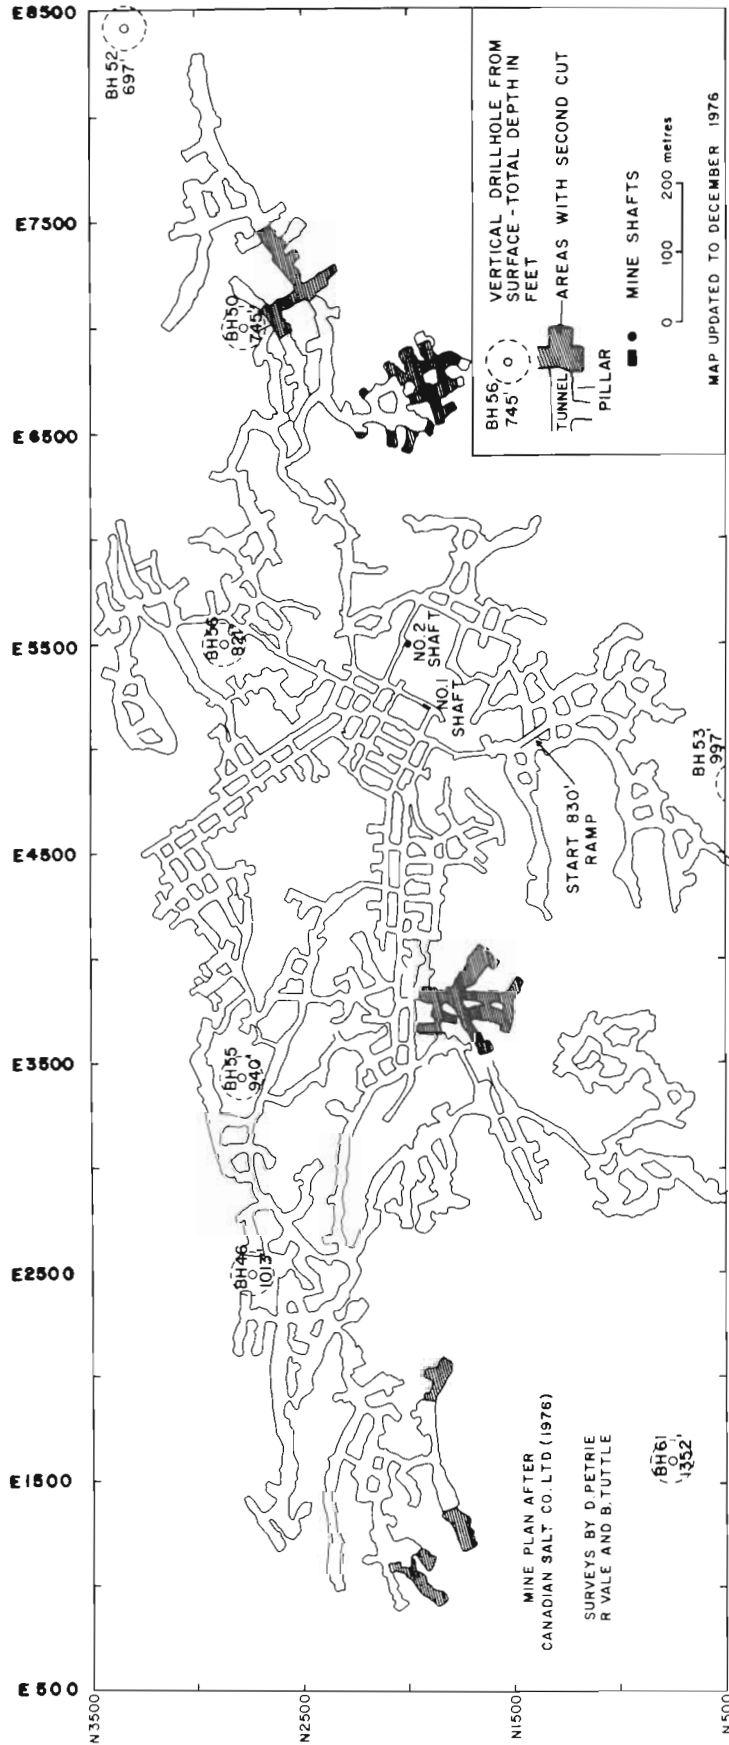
Updated mine plan, 630 foot level, Pugwash Mine.
